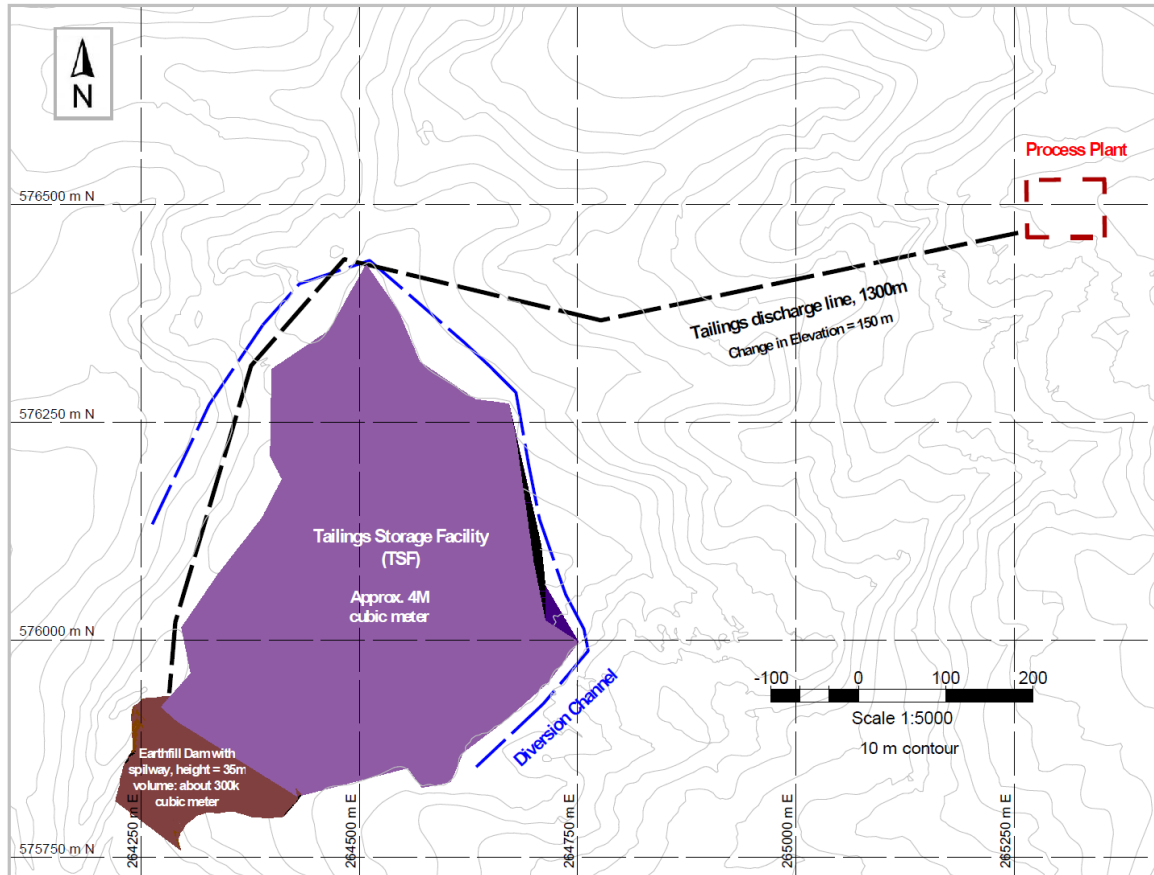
TSF (in Blue) with Earthfill Dam (in Red)
